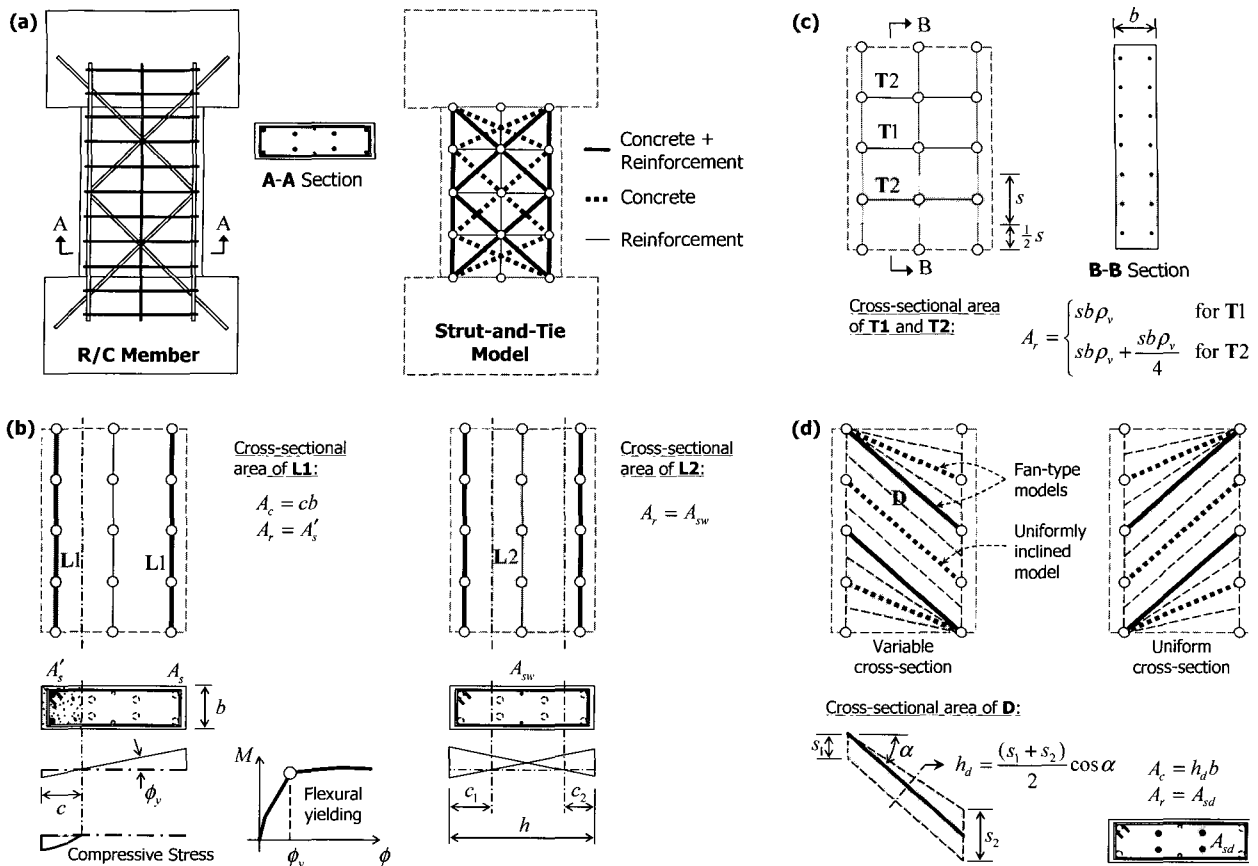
Modeling of concrete and steel elements: (a) Details and analytical truss model; (b) Longitudinal (flexural) elements; (c) Transverse (shear) elements; (d) Diagonal elements
